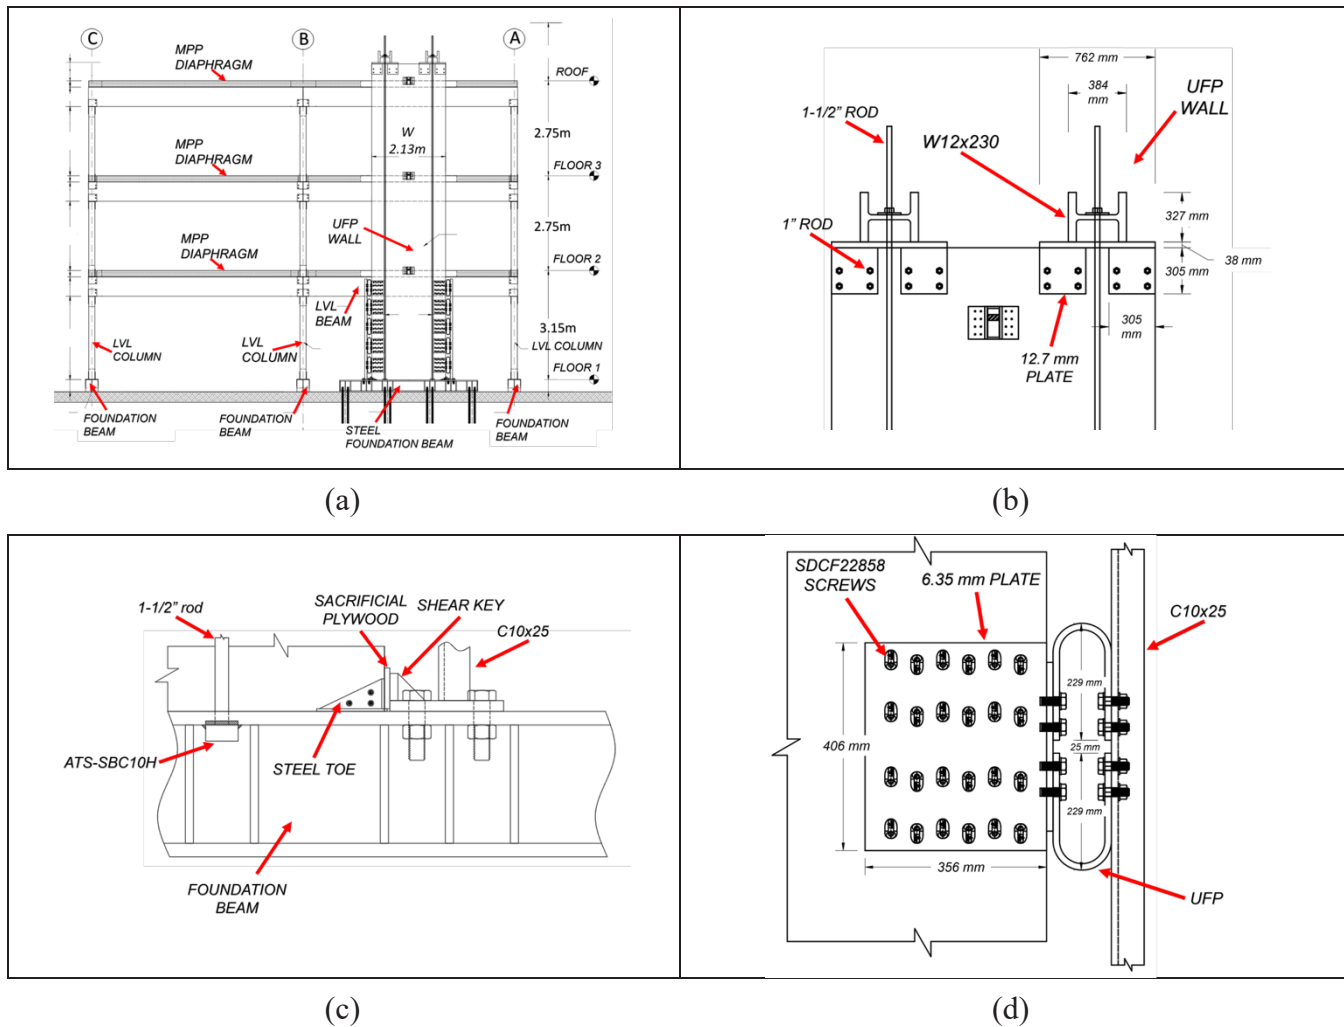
(a) Elevation view of test building with rocking wall; (b) steel anchor saddle at top of MPP wall; (c) steel anchor plate welded to foundation steel beam, shear key and steel toe details; and (d) UFP connection details.
